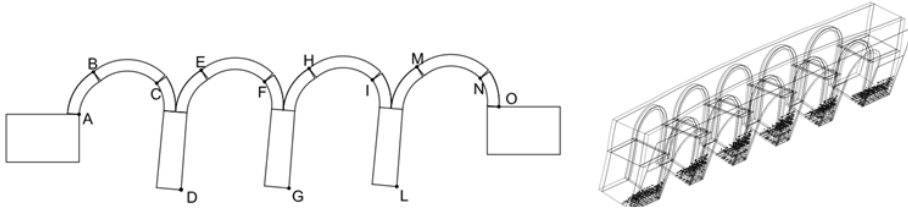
Masonry arch multi-span collapse mechanisms for bridges with slender piers in longitudinal (a) and transversal (b) directions.
